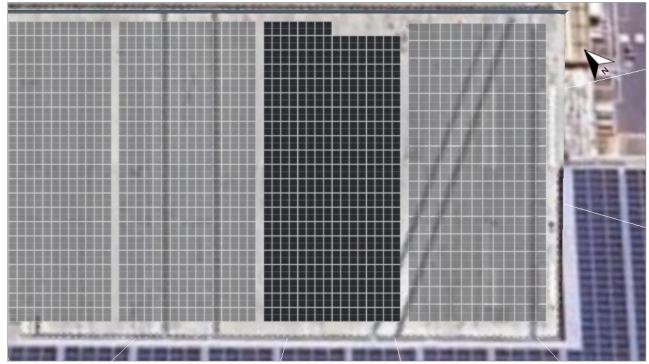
Module Area - Arbitrary Building 01-Mounting Surface Southwest
